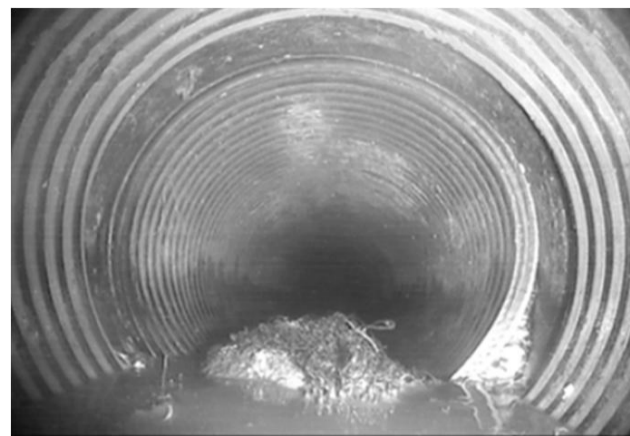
Robot blockage by deposits during inspection of sewer pipe
